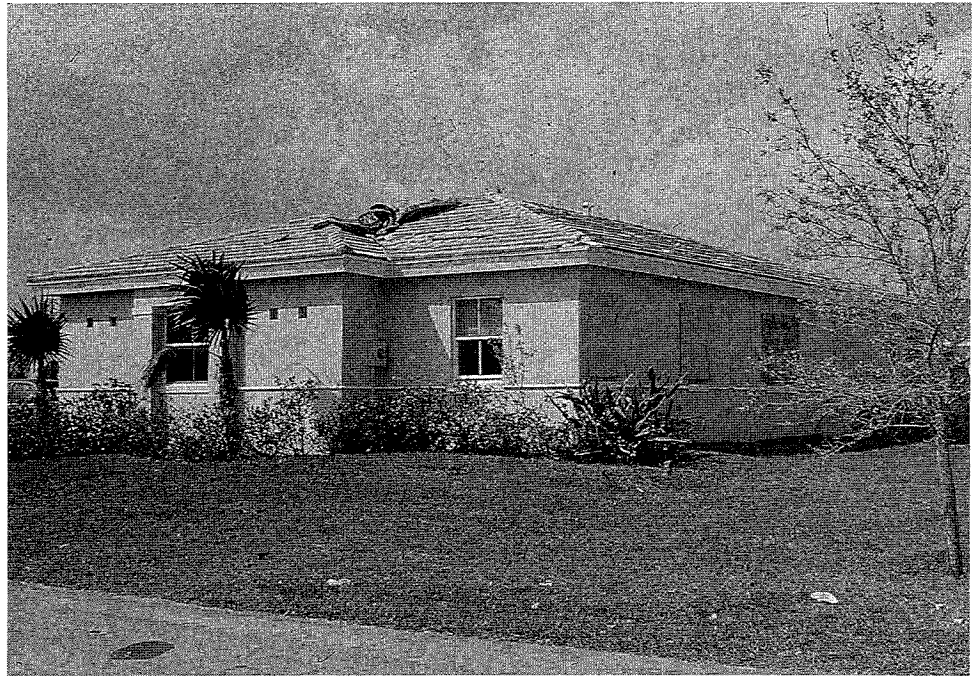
A low-profile hip roof with minimal wind damage. Loss of unprotected windows was the primary reason for the limited water damages noted on the survey sheet.
